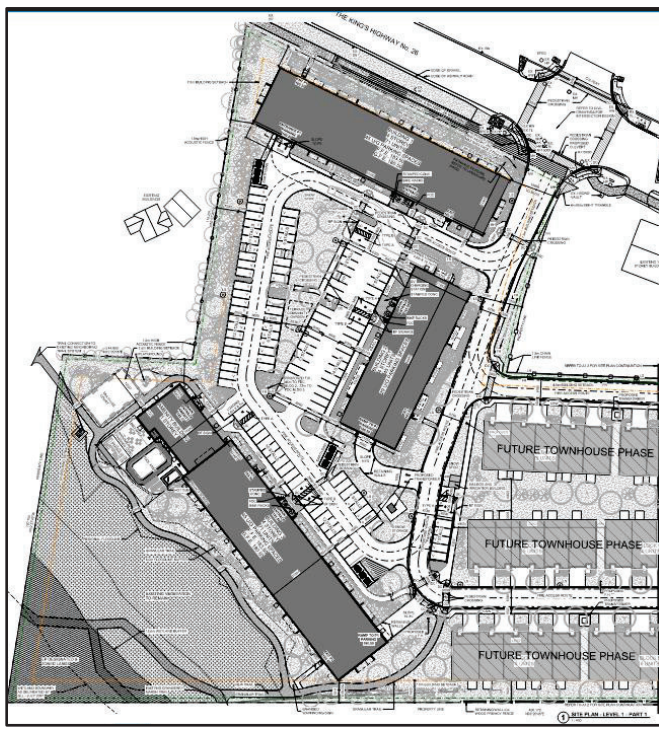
Previously approved site plan excerpt showing west side of the subject lands with three rental apartment buildings.
